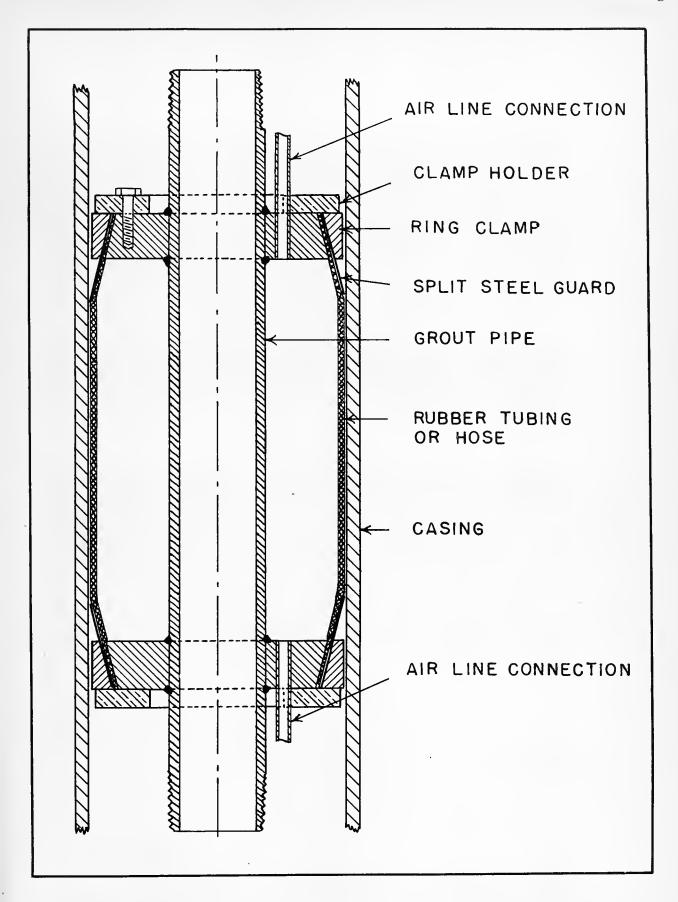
Sketch of Suggested Air Expanded Packer Plug.
